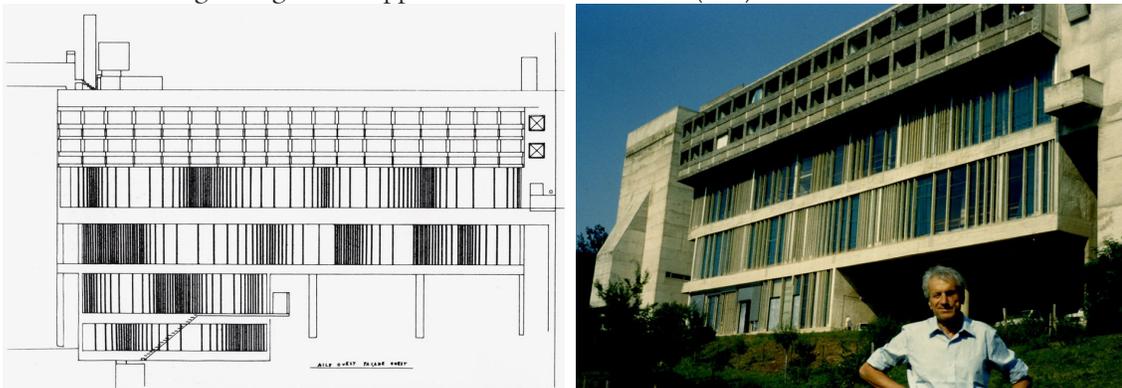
Elevation drawing and photograph of facade of Monastery at La Tourette.
